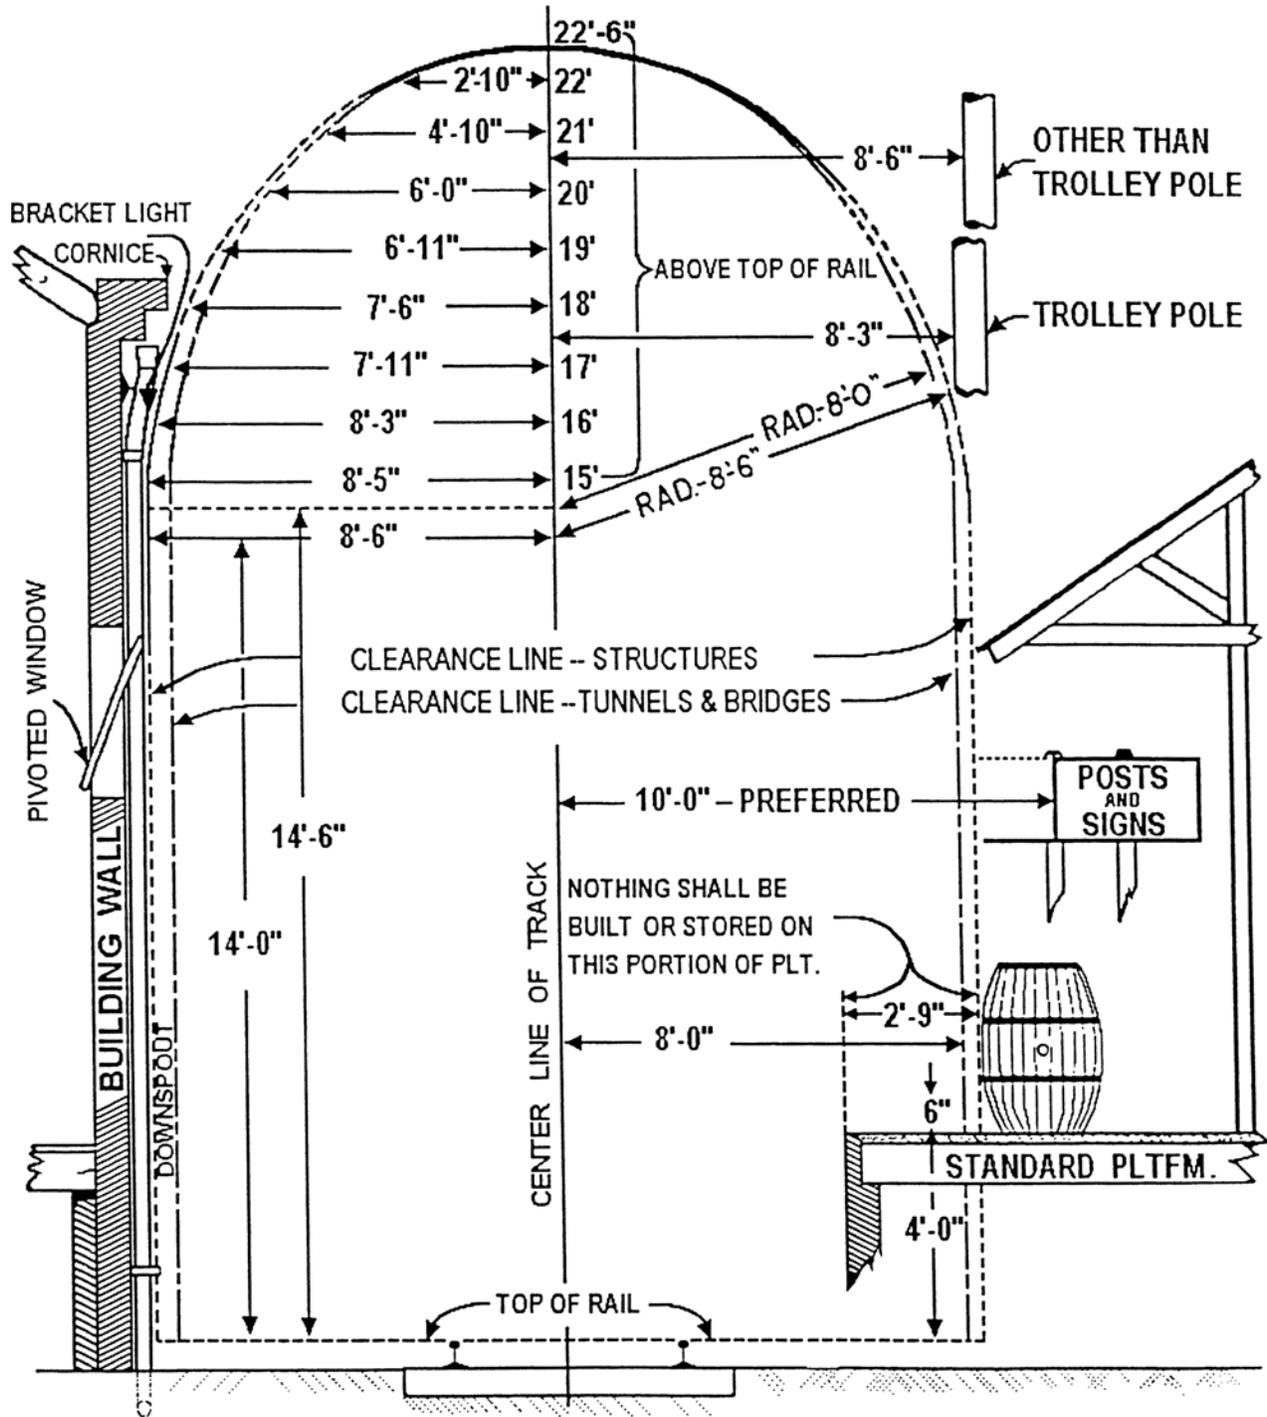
A - Minimum Side Clearance for Certain Structures in or on the Lower Sections of Bridges and Tunnels
